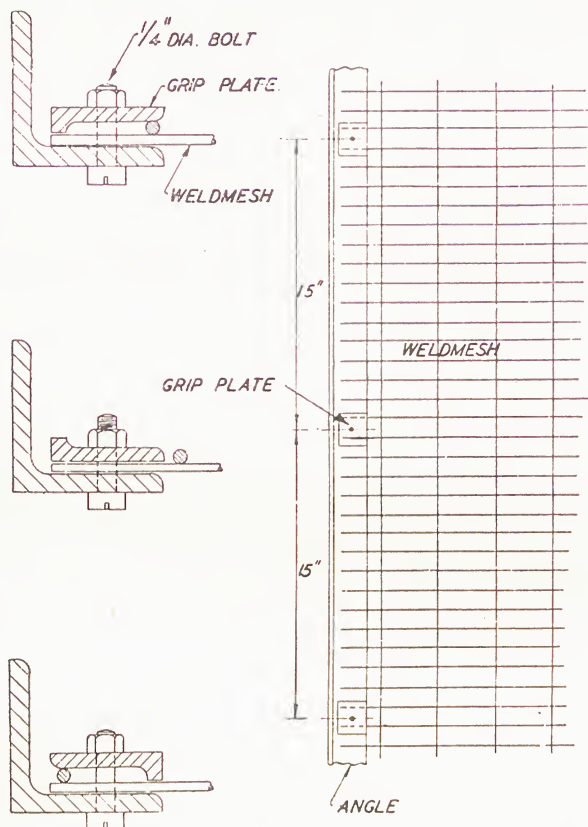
"Weldmesh" details. (By courtesy of the British Reinforced Concrete Co., Ltd.)
